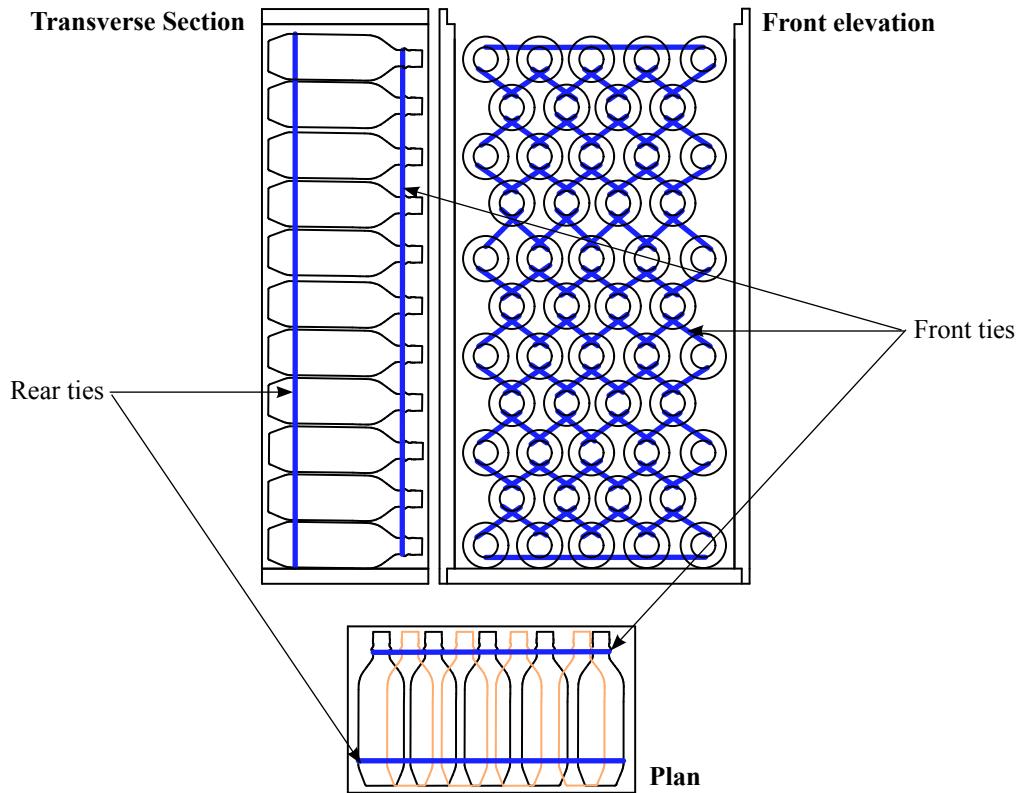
Bottles wall specimen Drawing, Scale 1:10
